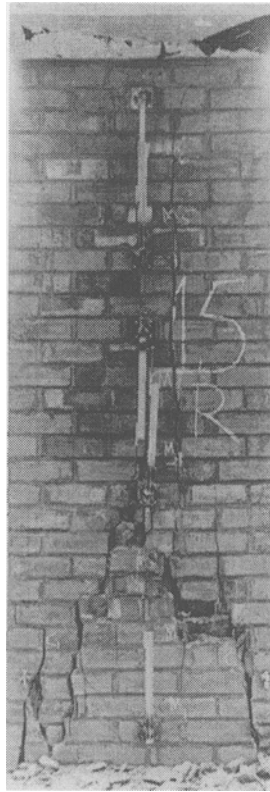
Failure of brick masonry wall in compression by vertical splitting and inclined shear cracking
